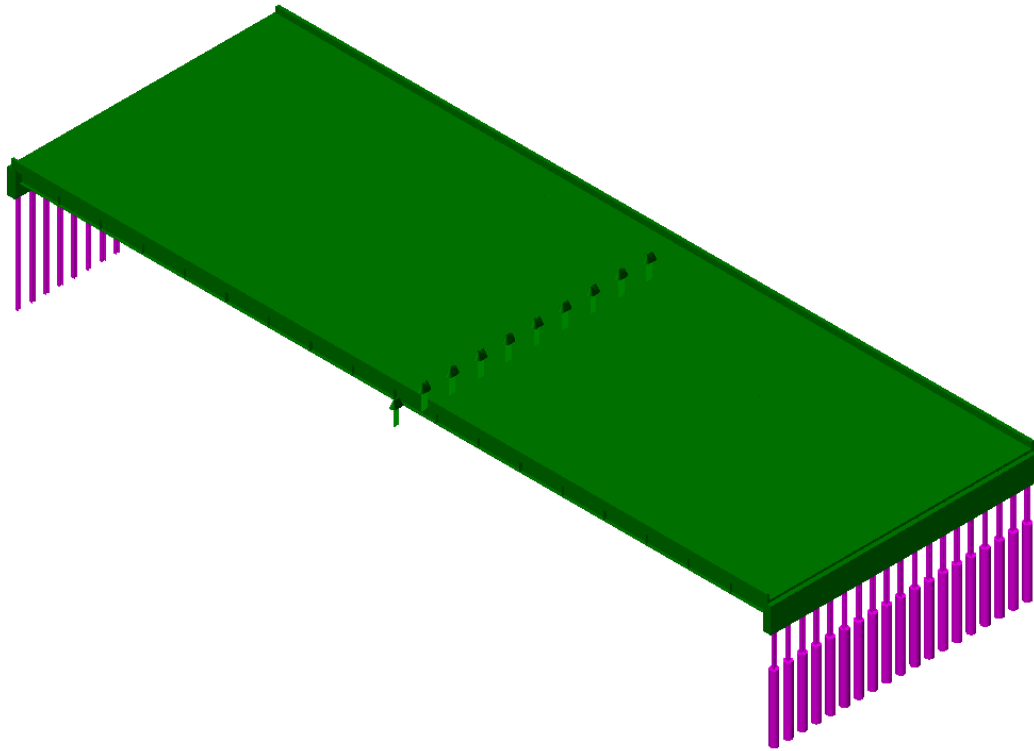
Scotch Road Bridge LUSAS 3D FE Model- Isometric View
